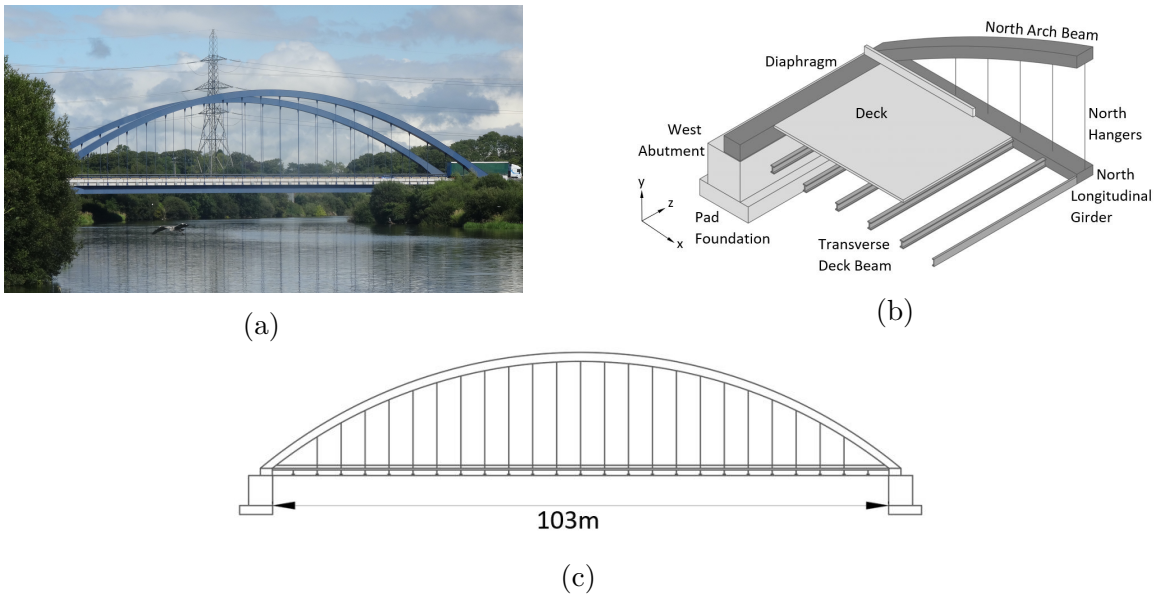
Tied-arch bridge (a) photo of the bridge, (b) shaded, stepped section of the bridge with labelled elements and (c) elevation of the bridge.
